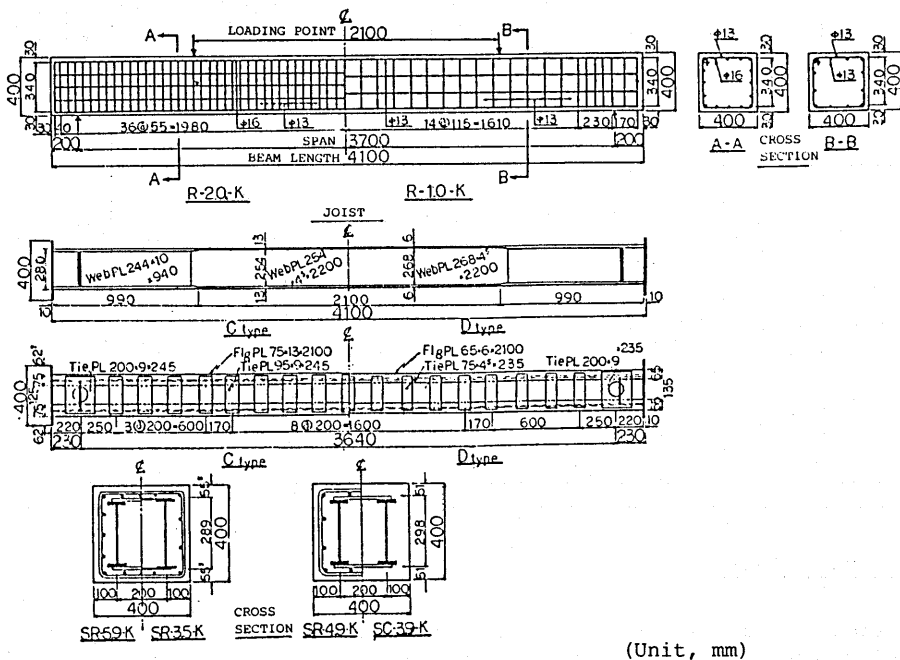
Details of beams of reinforced and steel-reinforced concrete.
